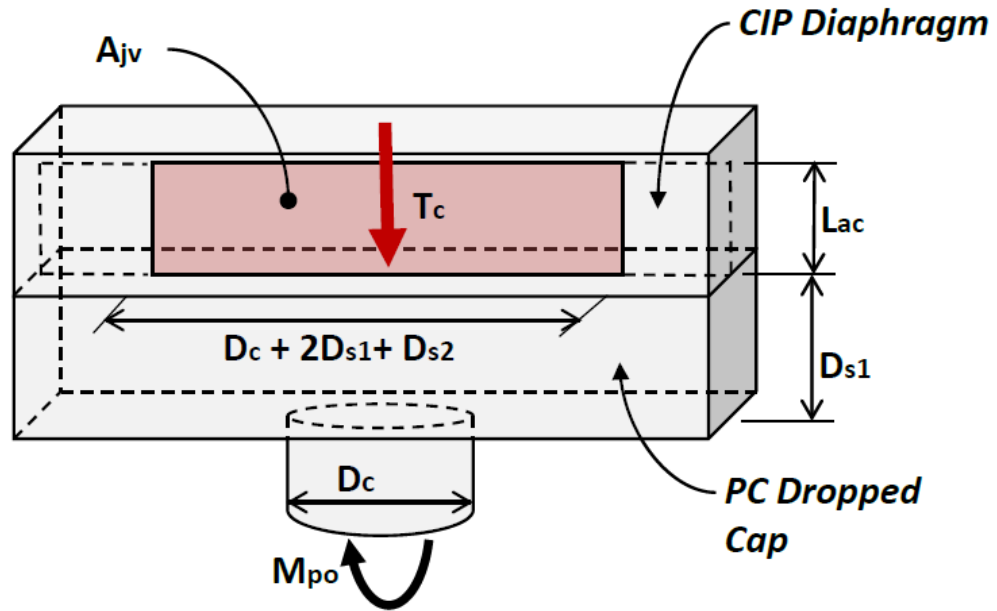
Diagram. Longitudinal loading—vertical joint shear stress.
